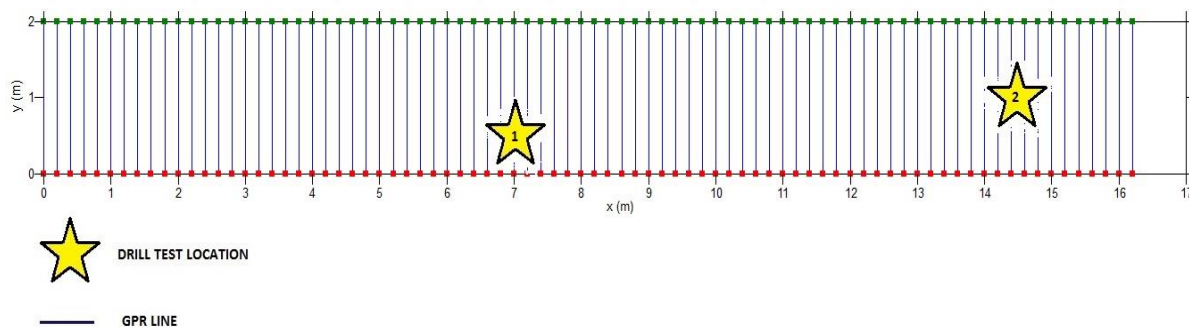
GPR Scan lines and drill test points – Abutment 1, Site B
